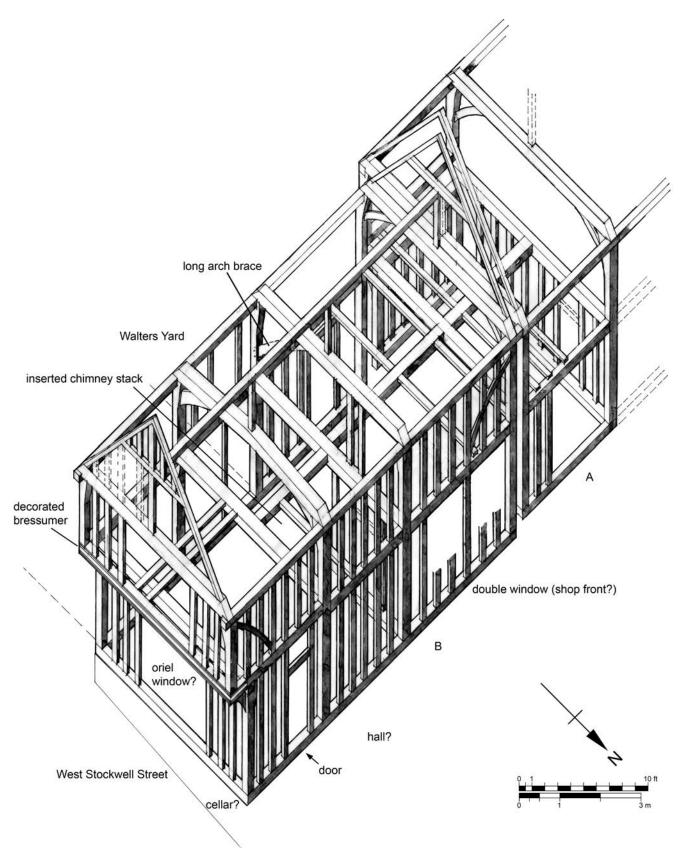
Isometric view of Walters Yard and the corner of 56 West Stockwell Street (Parts A and B) (corpus no. 106)
